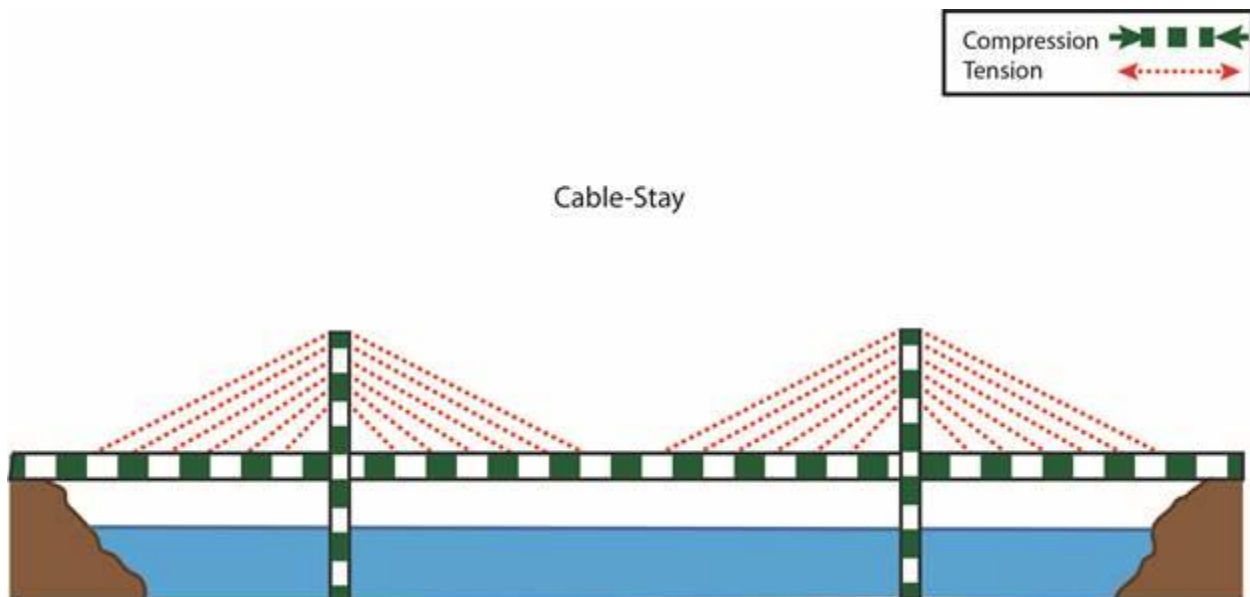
Axial Tension in a Cable-Stay Bridge
